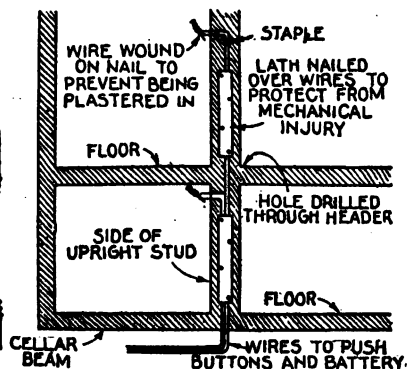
,344.—Method of installing bell wires in unfinished house of wood construction.
